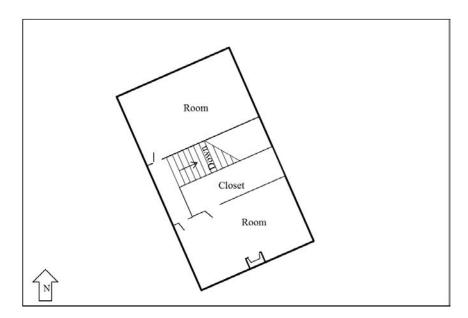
Second Floor Plan of the Forbes House, Not Drawn to Scale.
